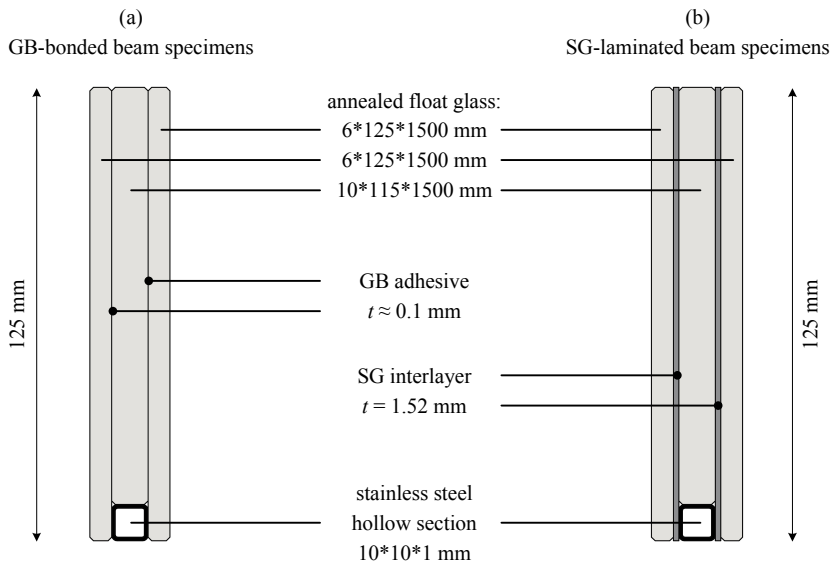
Cross section of the 1.5 m long reinforced glass beam specimens;
